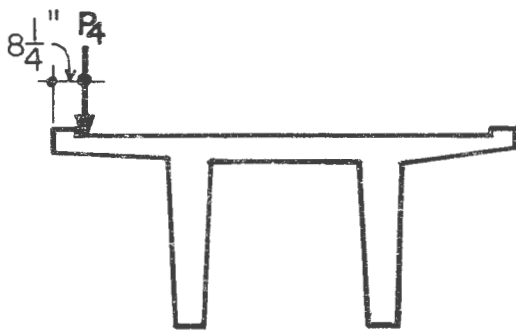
Local Horizontal Cracks at Midspan - Girder 3 at
